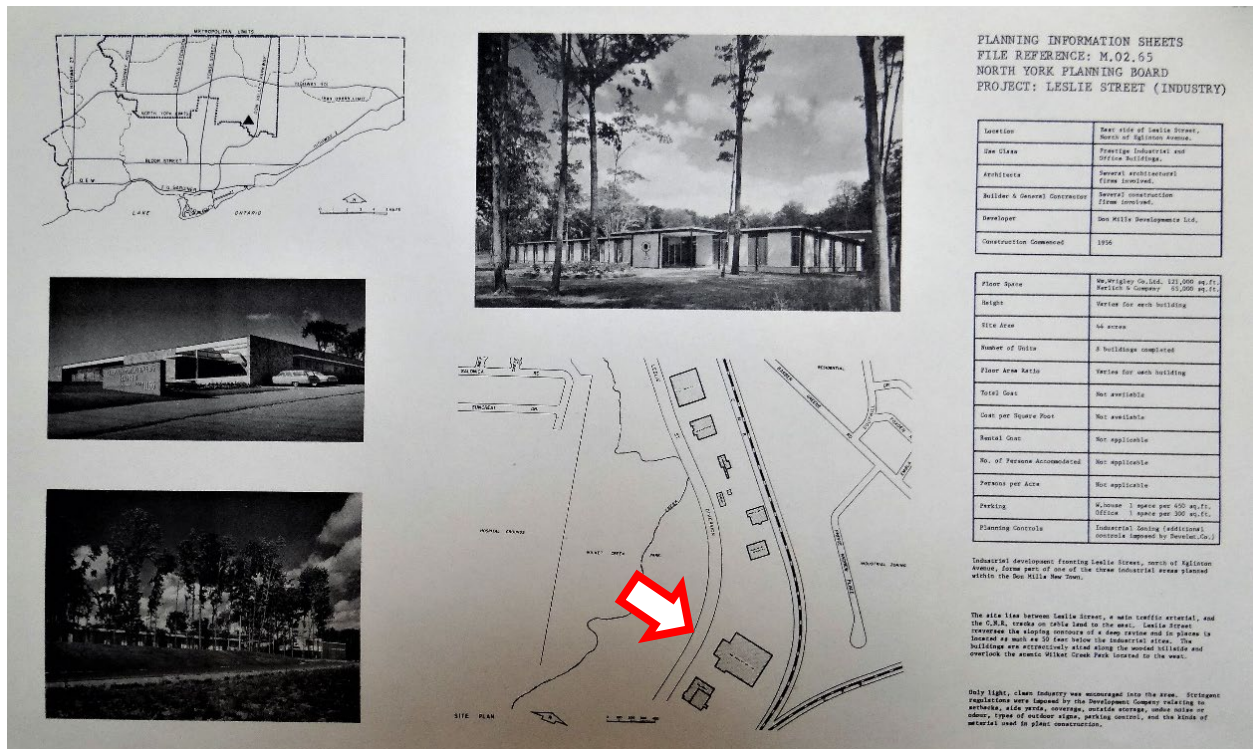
North York Planning Board, Planning Information Sheet showing plans for Leslie Street as the third industrial zone of the Don Mills area; the red arrow indicates the location of the subject property (City of Toronto Archives, Fonds 220, Series 40, File 39)
